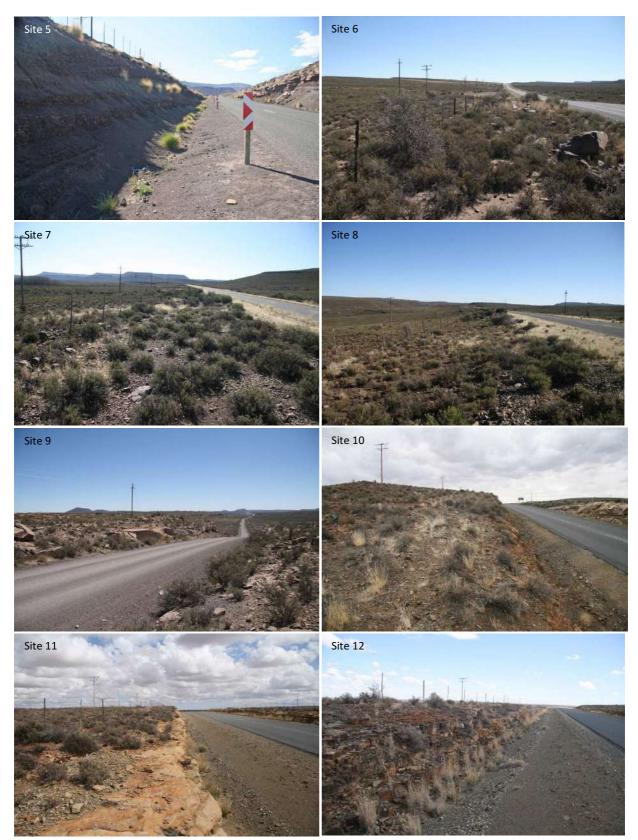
Instances on the underground section where trench location needs to be reconsidered. (a) Site 5; (b) Site 6; (c) Site 7; (d) Site 8 (e) Site 9; (f) Site 10; (g) Site 11; and (h) Site 12 (see text for GPS co-ordinates).
